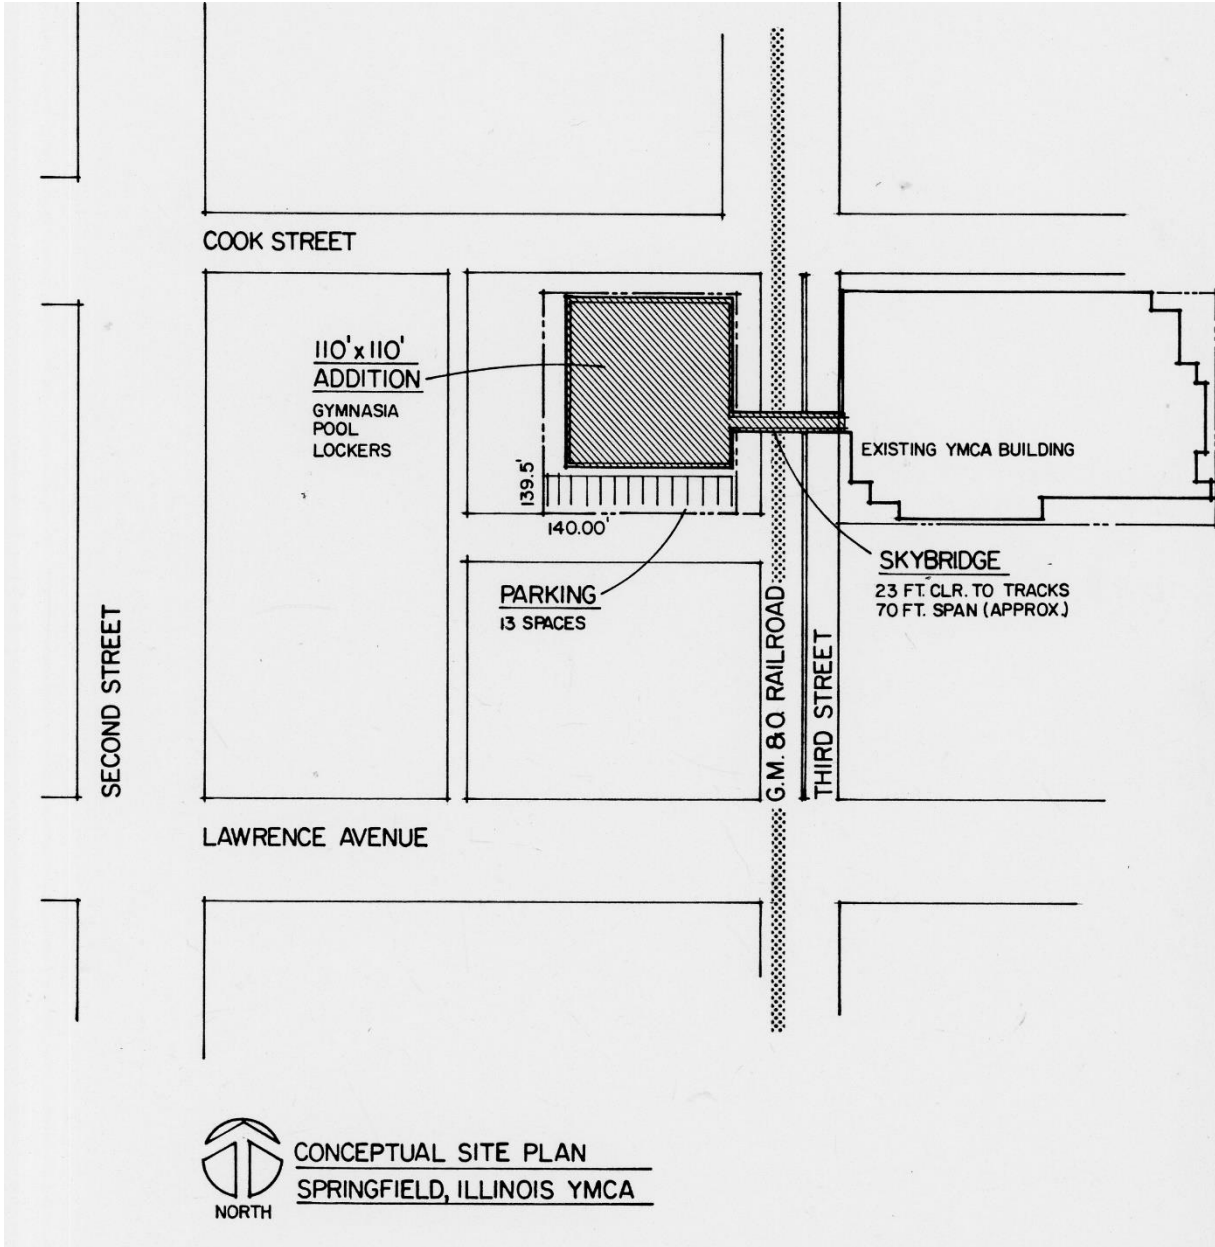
Conceptual site plan of proposed new addition, 1984. As originally designed the building would be approximately 110' square and include a new pool, gymnasium, and both male and female locker room facilities. It was to be connected to the main facility by a 70' long, elevated walkway (or "skybridge") over the adjacent railroad tracks (Building and Furnishings Service, February 1984).
